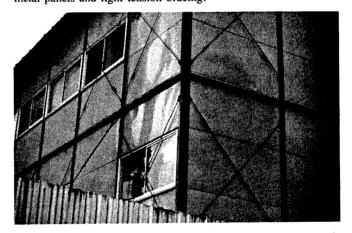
Mass produced prefabricated steel housing unit with metal panels and light tension bracing.
